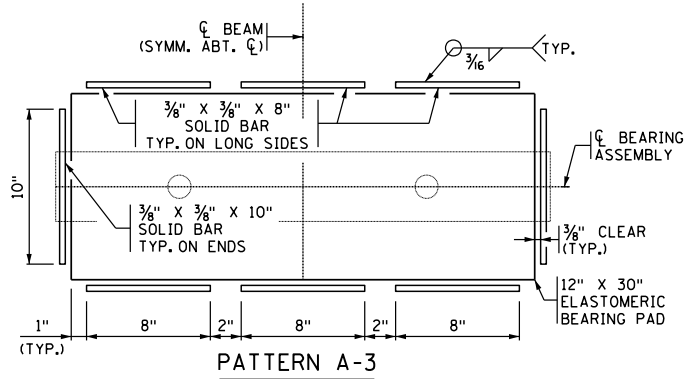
Standard MnDOT detail B307 Bearing Pad Restraint
